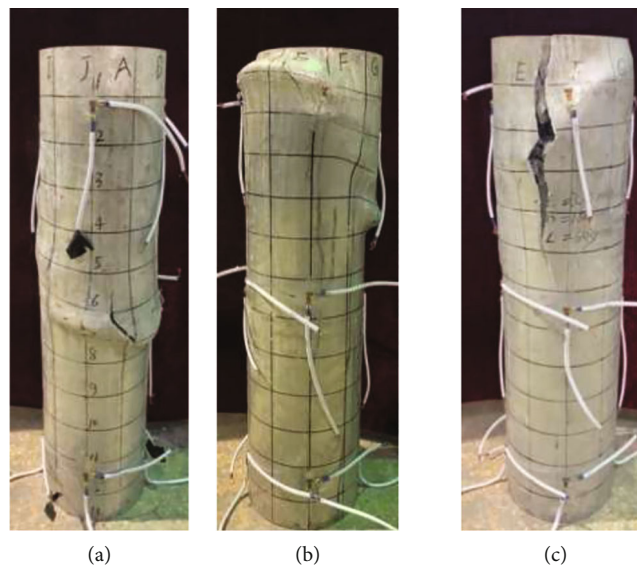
Failure pattern of aluminum alloy concrete columns.
